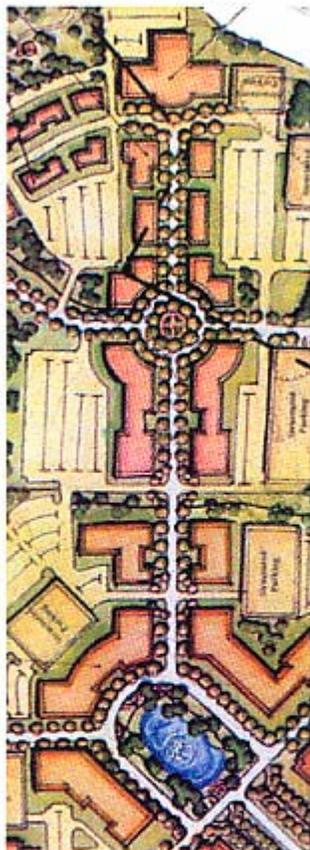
Town Center Layout with buildings fronting primary street and parking behind.
